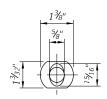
DETAIL 'S' - HALF SPACING ELEVATION (AS REQD. PER THE PLANS)
